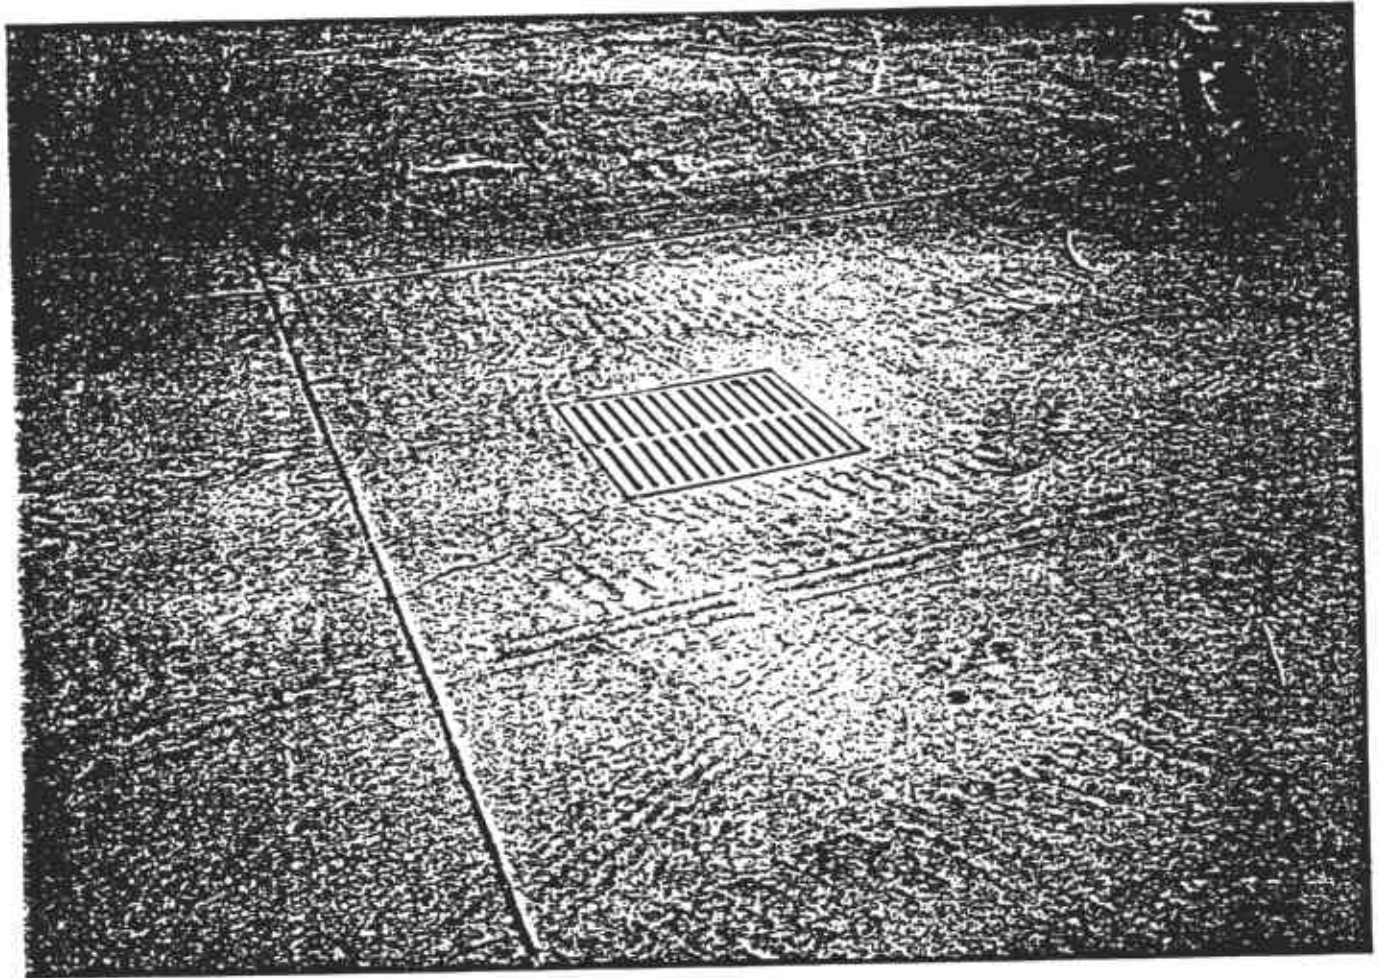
STORM DRAIN LOCATED NEAR BOAT
